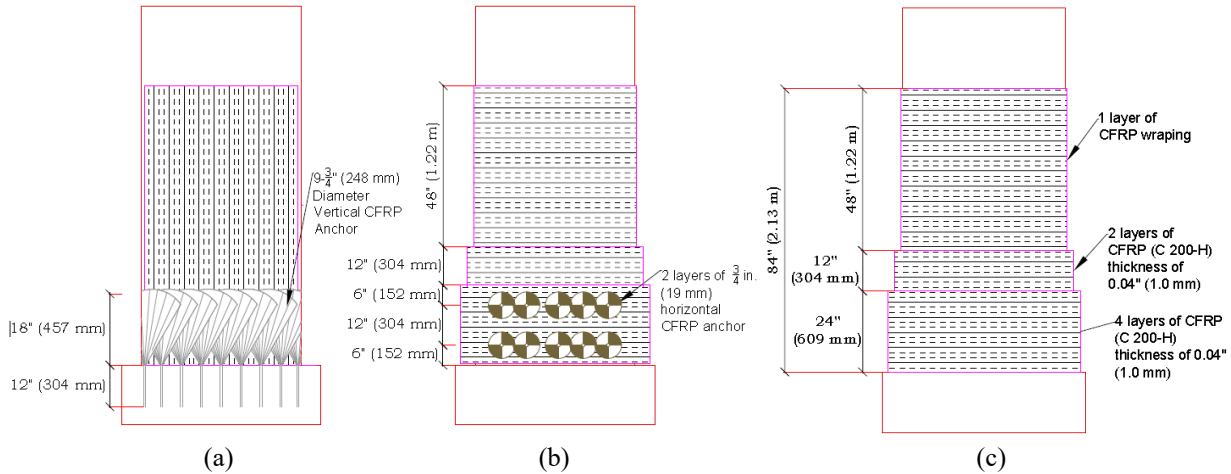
Retrofit design; (a) vertical CFRP sheet and CFRP anchors, (b) horizontal CFRP anchors, (c) hoop direction CFRP wraps
